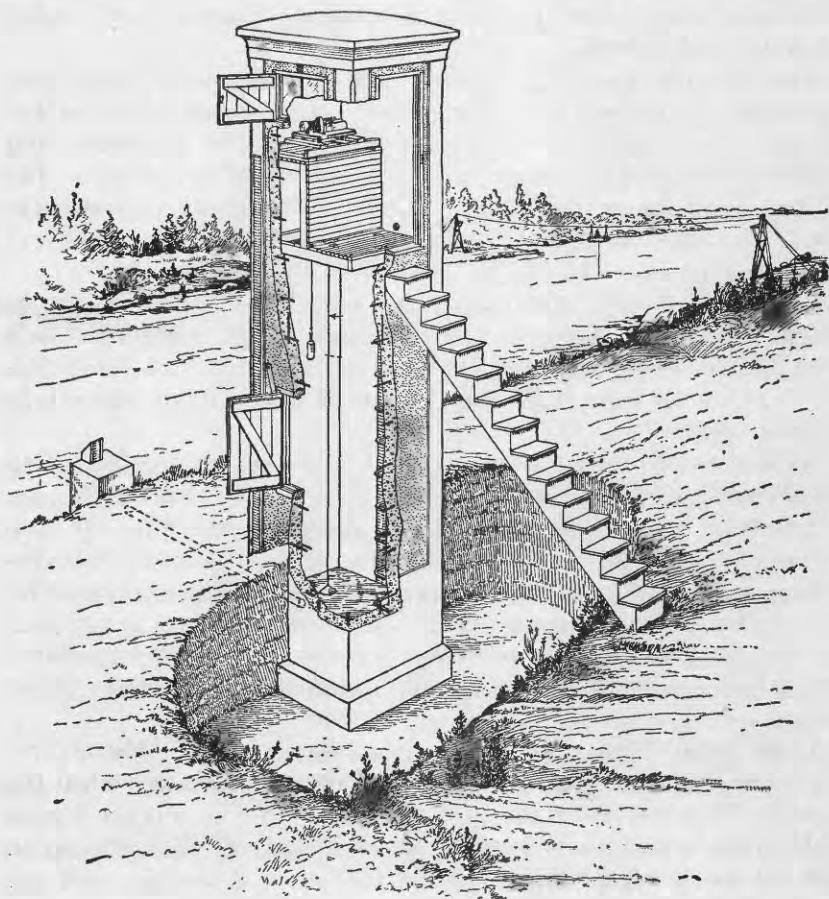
Typical river-measurement station showing concrete well and house for water-stage recorder and staff gages, cable, and car
